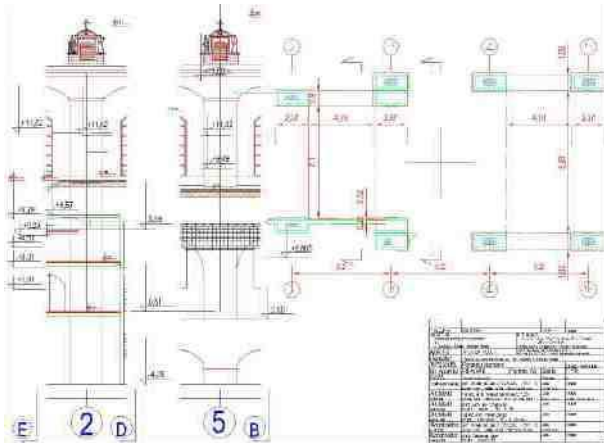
Two typical masonry-reinforced-concrete columns-chimneys. At top over roof is visible decorative element with sculptures. Additionally are shown ventilation flues. PB-K-97b, A3.
